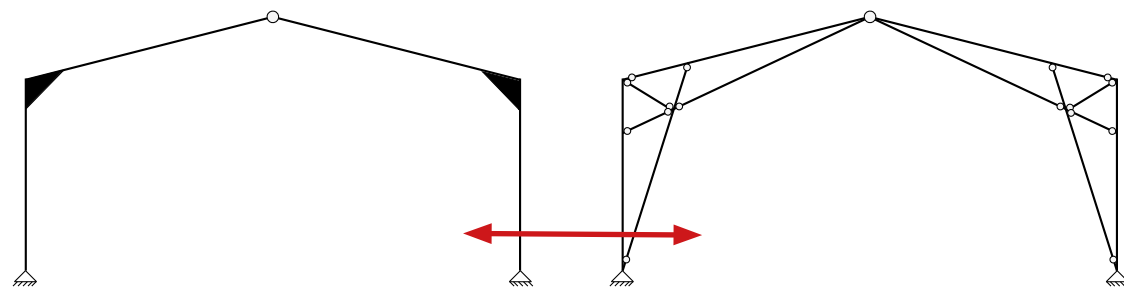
Left a three hinged frame with fixed corners, right a three hinged frame with strengthened corners.
